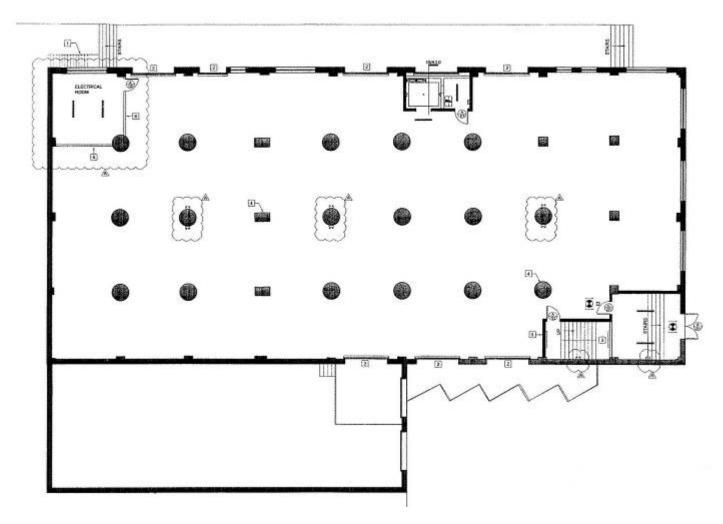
Cheek-Neal Coffee Company Building – Typical 2<sup>nd</sup>-5<sup>th</sup> Floor Plan
